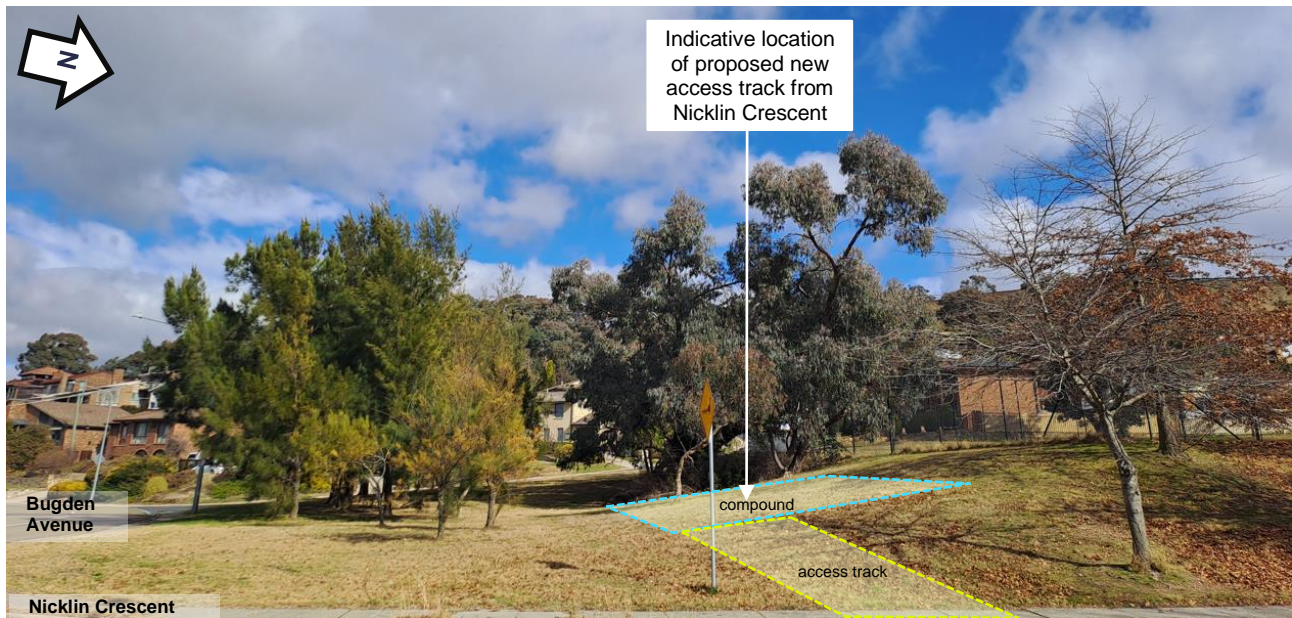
View from Nicklin Crescent towards the proposed facility. Proposed new crossover and site access from Nicklin Crescent is indicatively shown. (Source: Downer, Aug 2024).
